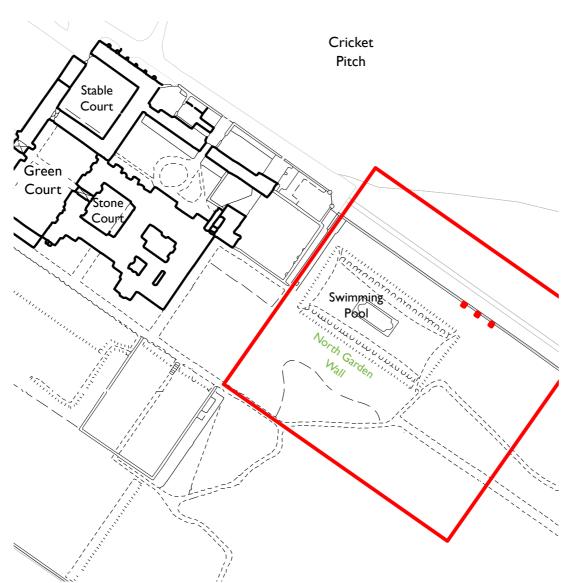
(above left): A plan showing the location of the north garden wall and proposed buttresses
